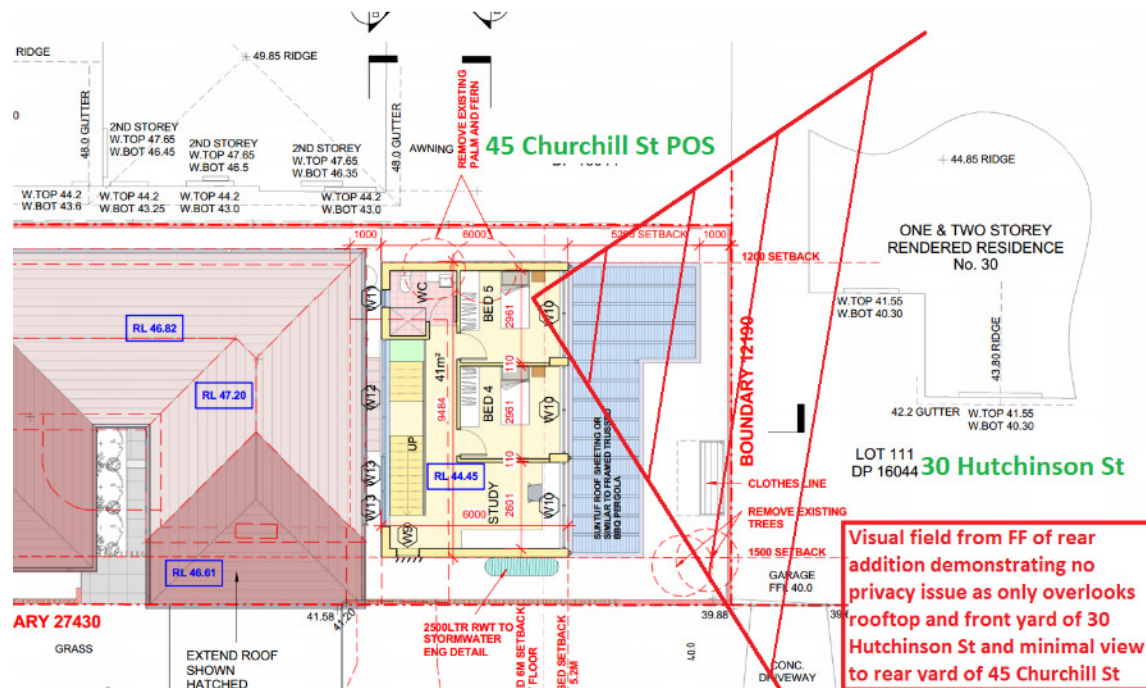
Marked First Floor Plan demonstrating that there will be no privacy issue from the first floor.
